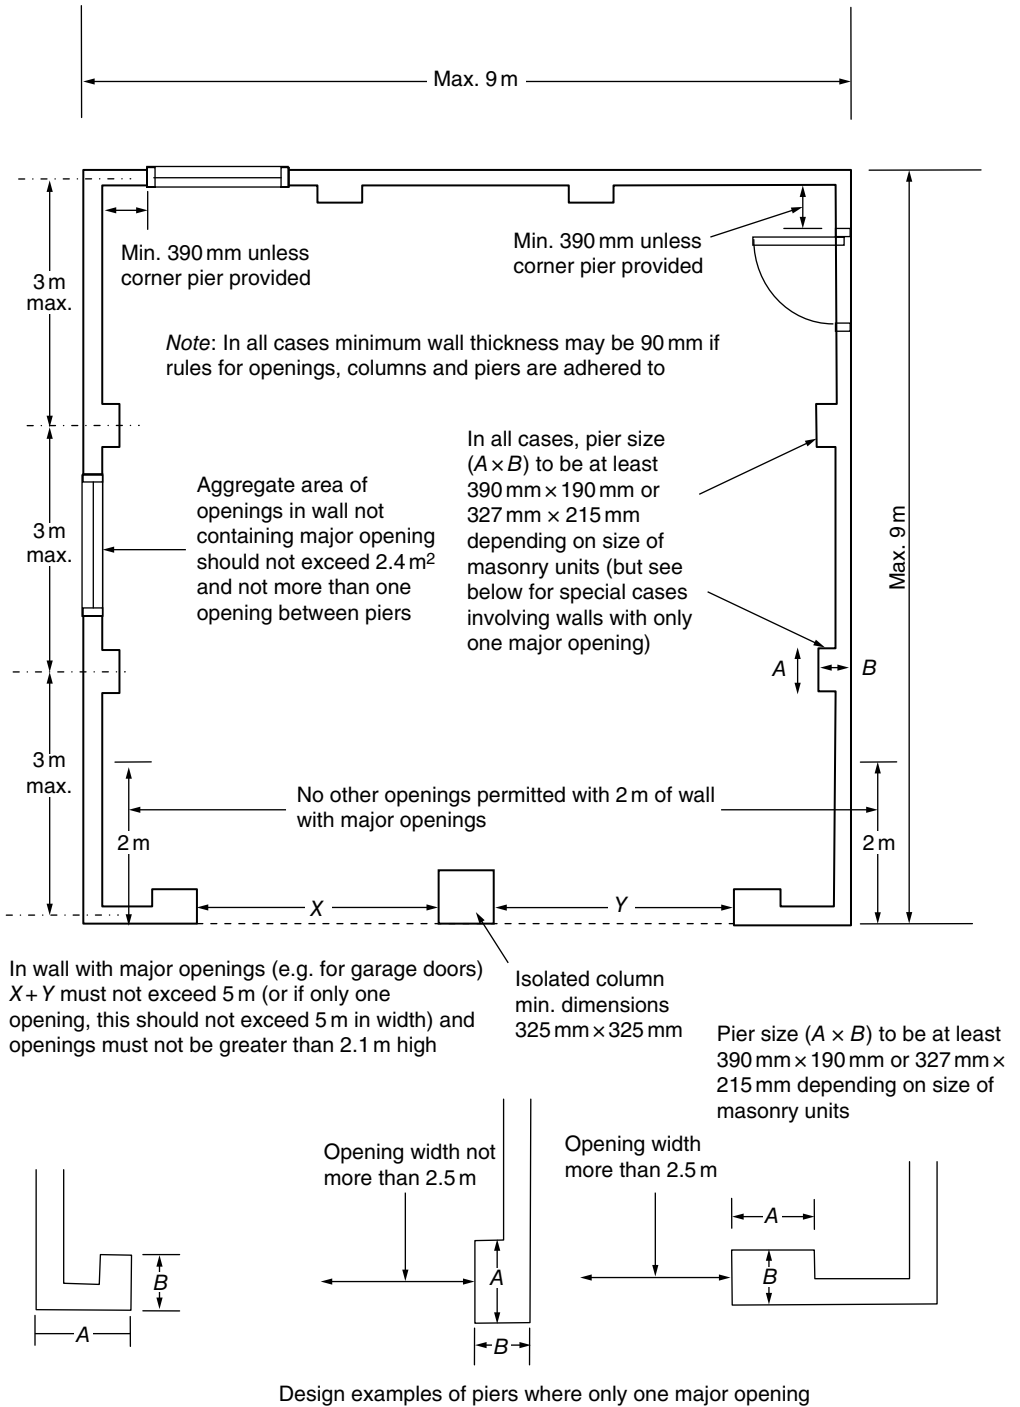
Small buildings and annexes – design of openings, piers and columns.
